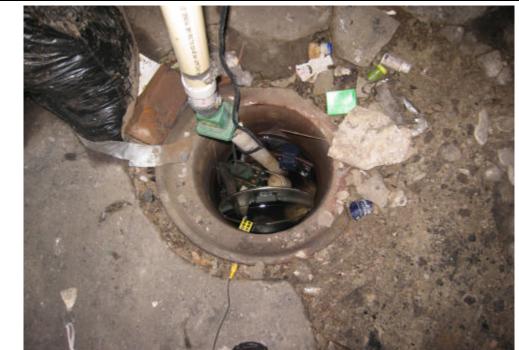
Inside basement of 507 E. Washington looking at water in swamp. Note broken concrete floor slab and exposed soil.
